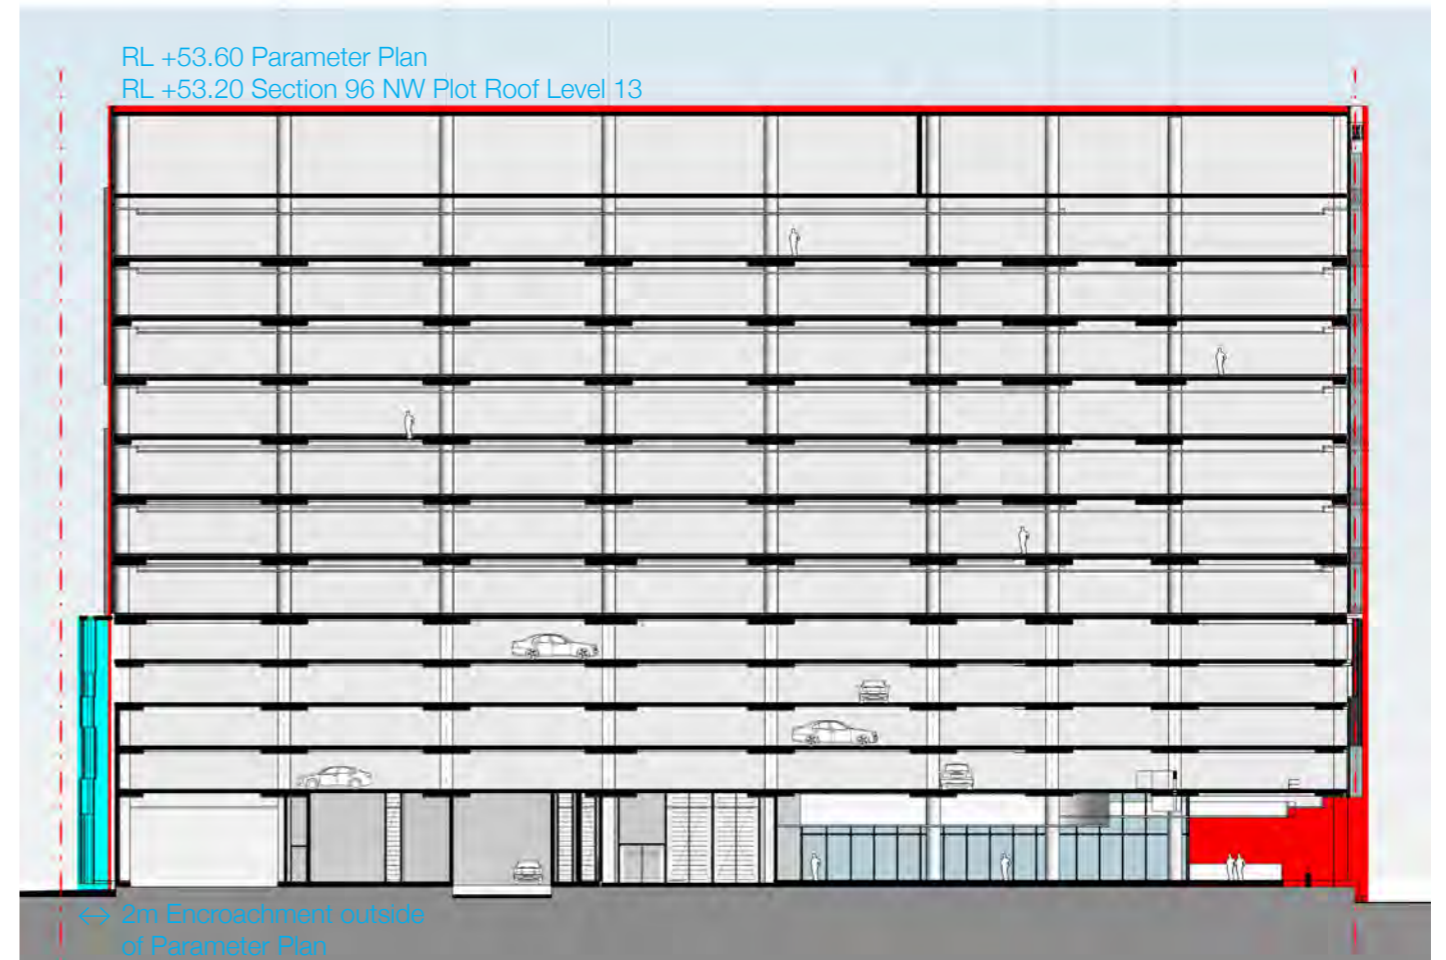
Section 96 NW Plot proposed building east west section with Parameter Plan envelope overlay
